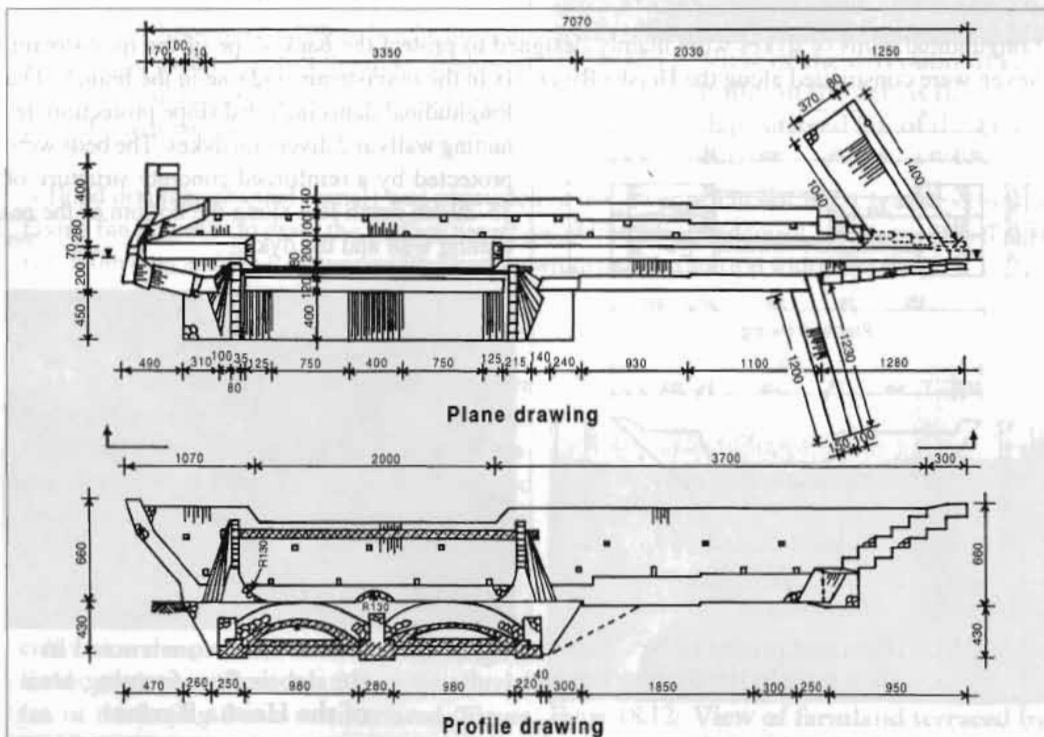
Plan and profile of sediment trapping dam No. 5 with double arch foundation
